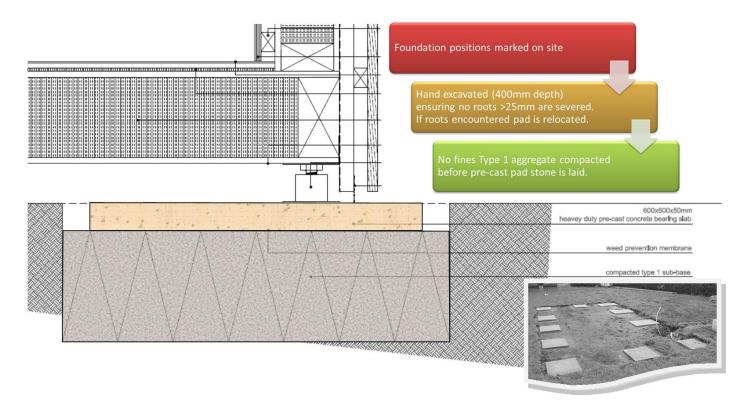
Typical pad detail with installation (inset). This approach removes the need for a 'strip' foundation reducing the impact on underlying roots. Note: T1 encroachment so minimal that foundations unlikely to have any negative impact regardless of proposed type.
